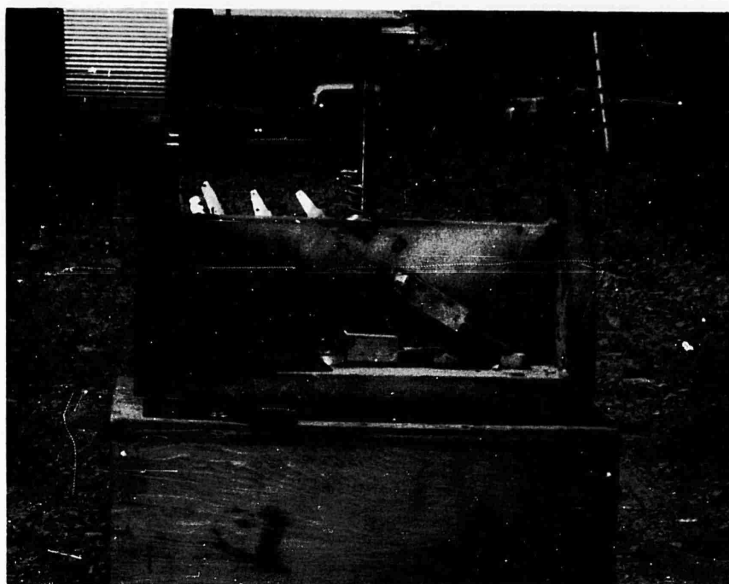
Damaged vertical gage from B drift access tunnel floor. (FCWT DASA 290 (238-01) NTS-62)
